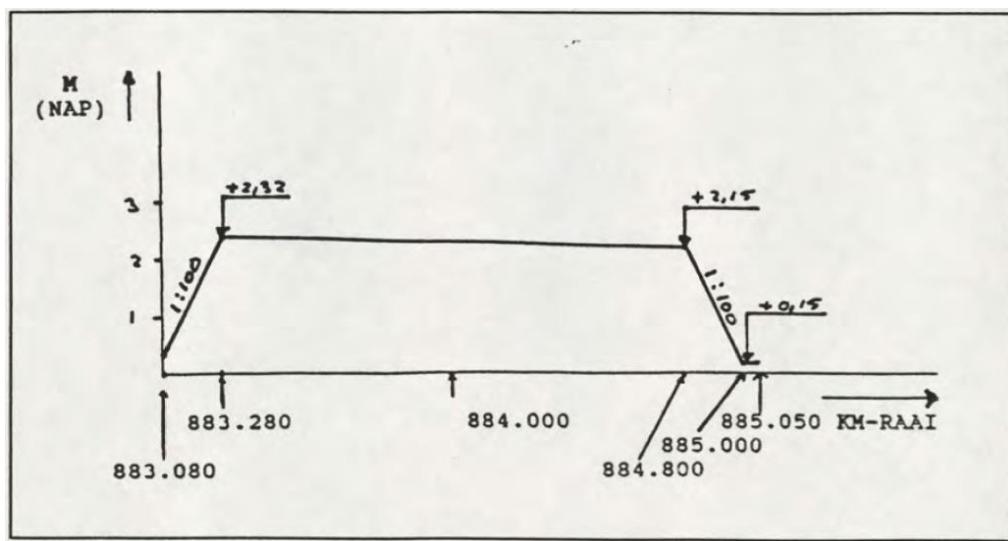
LOCATION AND ELEVATION LEVEL OF FIXED LAYER AT CONSTRUCTION (IMAGE FROM FRANSSEN, 1995)
